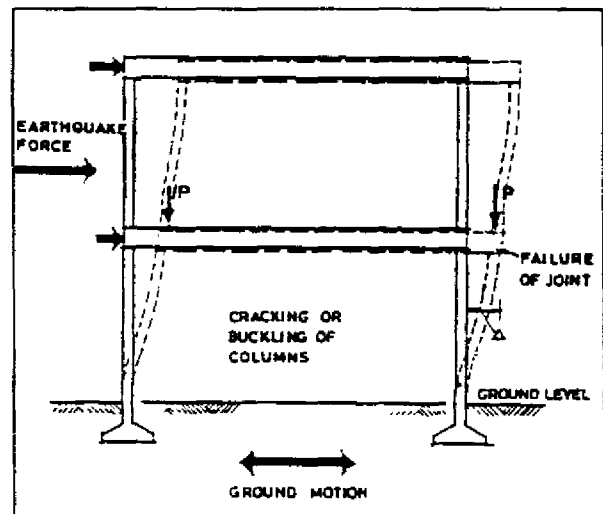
Failure of Columns due to Excessive Bending [1]
